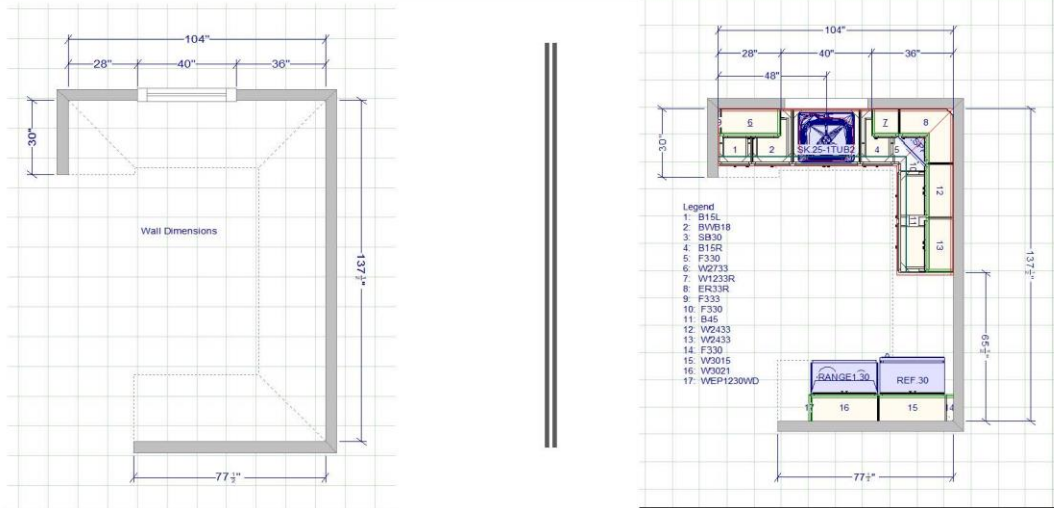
Exhibit D: Kitchen Floor Plan and Cabinet Layout
